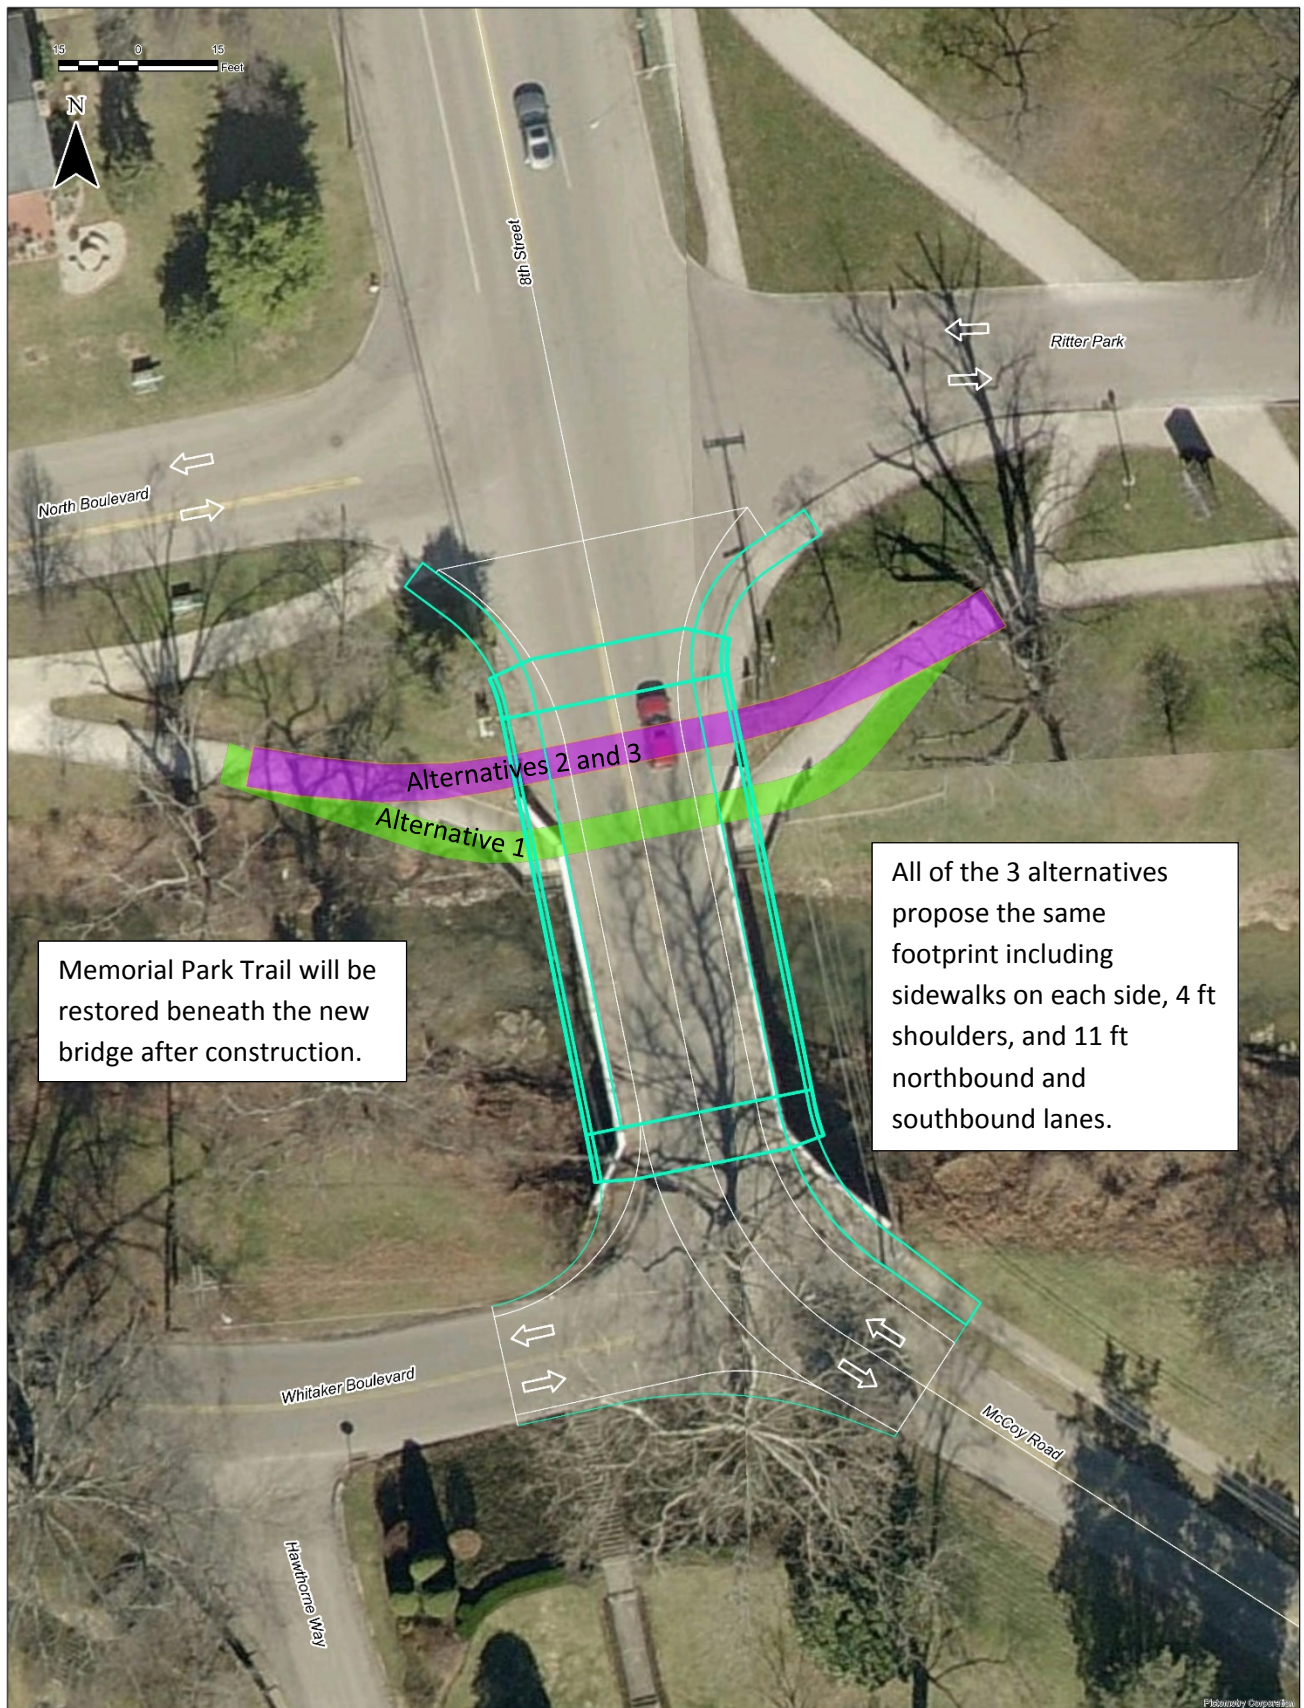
The proposed future location of the trail with each of the 8th Street Bridge alternatives.
